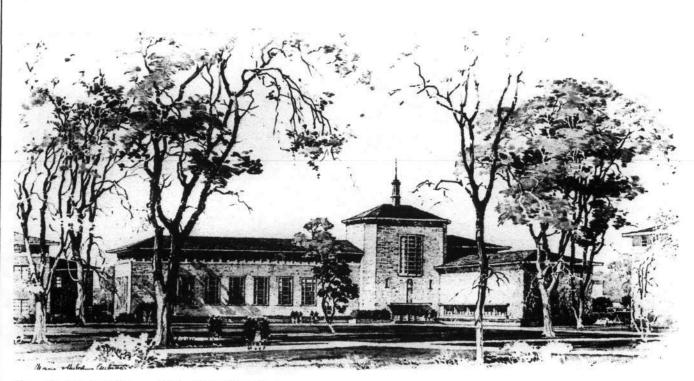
John C. B. Moore and Robert S. Hutchins, Campus Development Plan and Library, Goucher College, 1938. Library perspective by T. Kautzky, 1947. (Photo courtesy Goucher College.)
